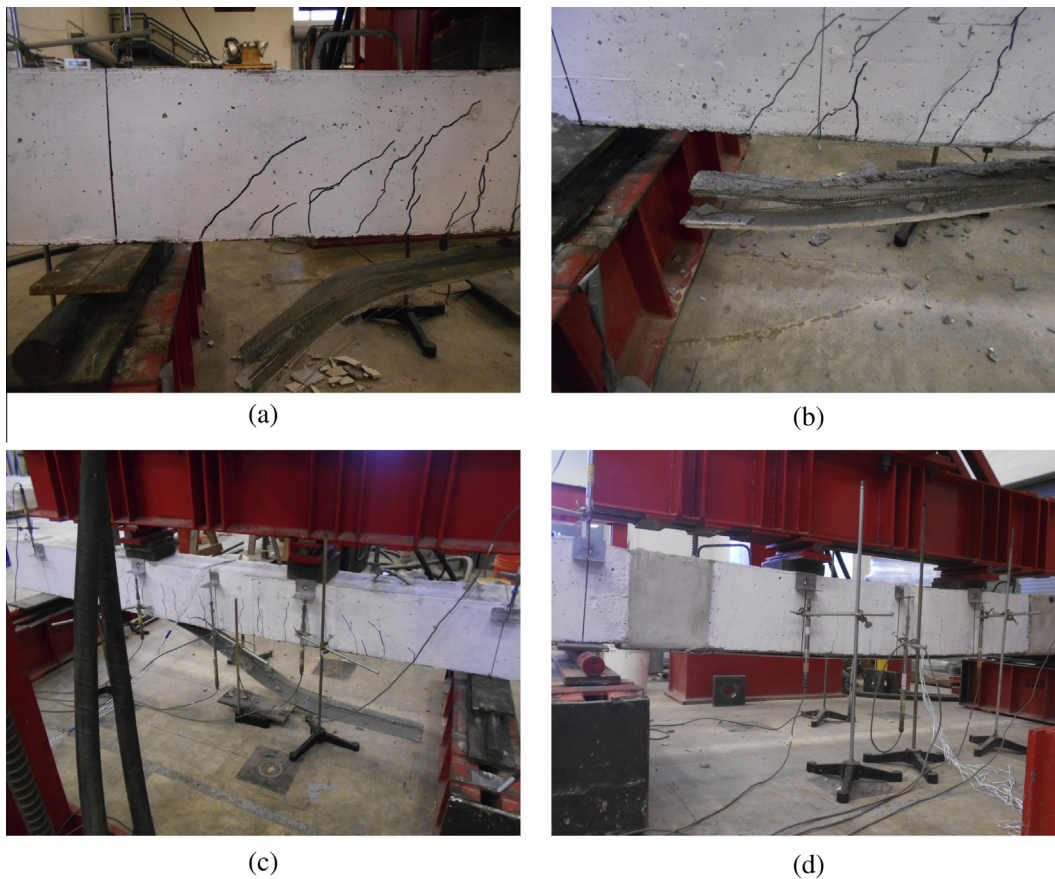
Photos of beam failure modes (a) B_K_1V, (b) B_K_2V, (c) B_K_L_1V, and (d) B_K_U_1V.
